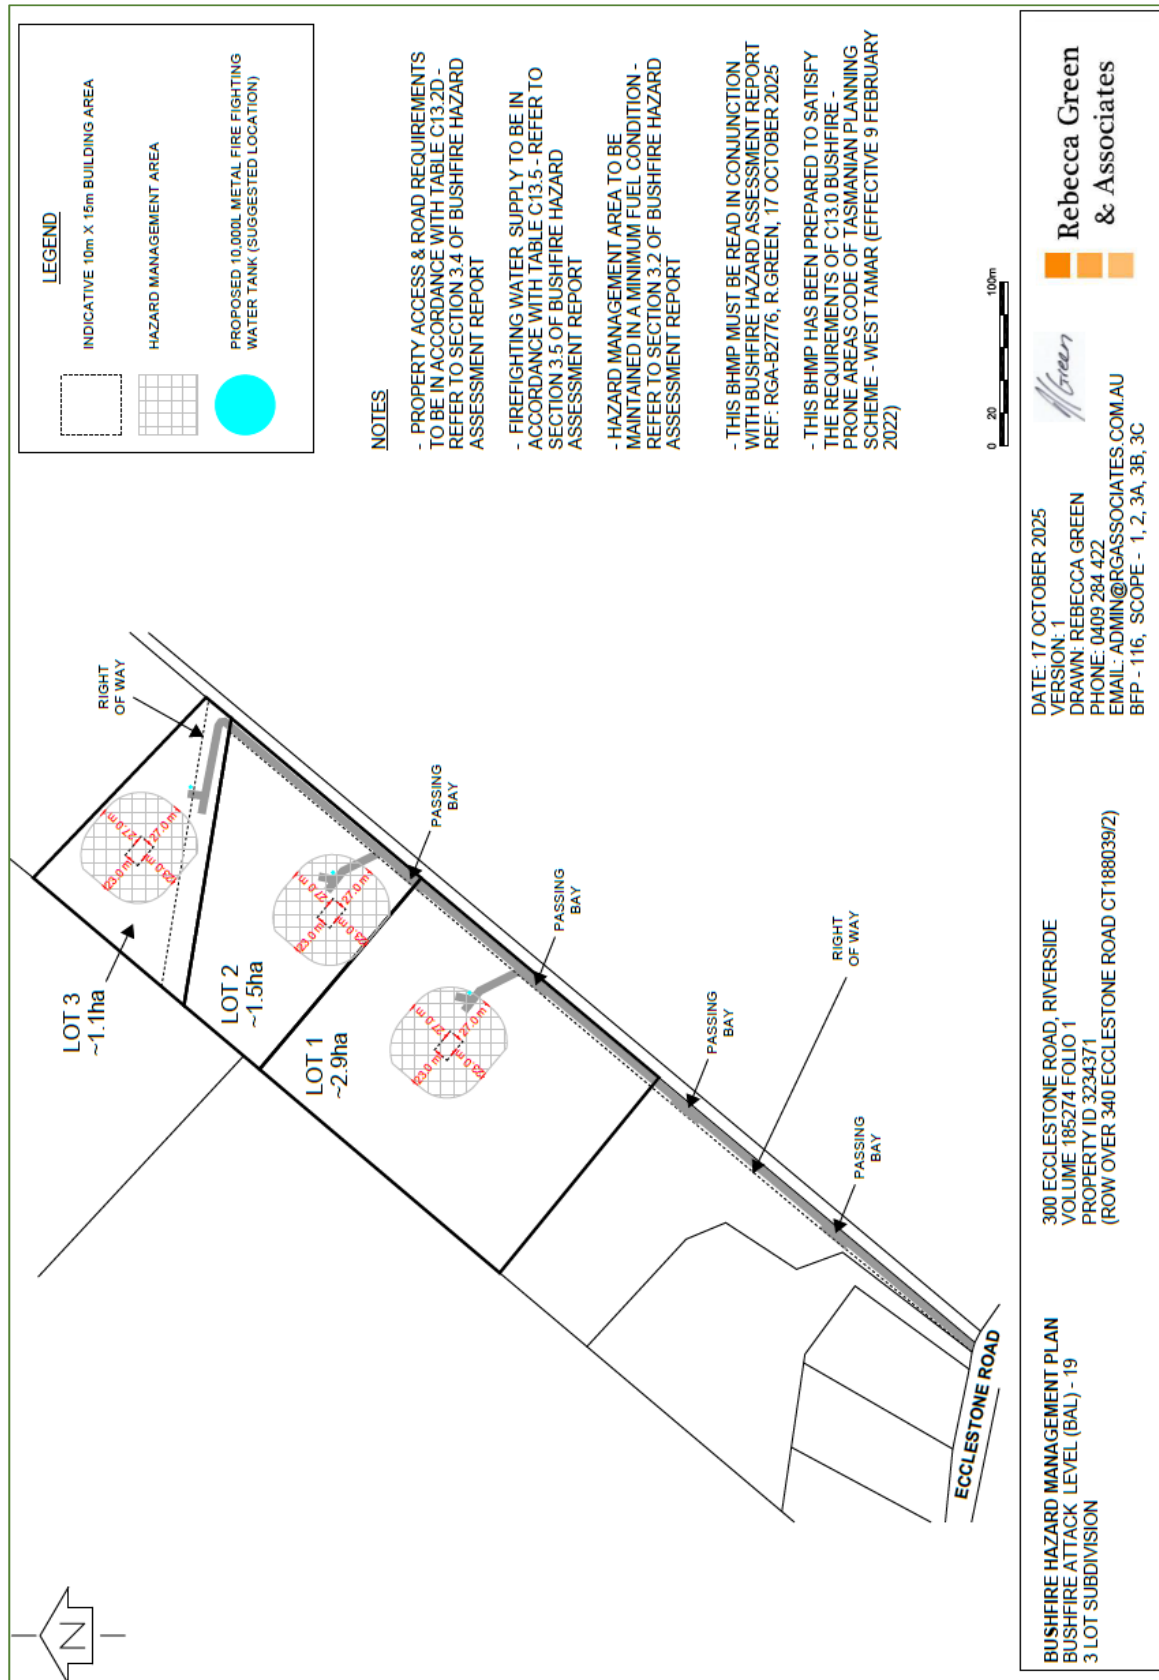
Proposed subdivision layout and bushfire hazard management plan
